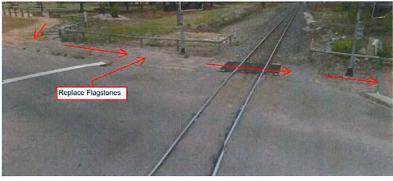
Memorial Road path – removal of flagstones and connection to pavers
